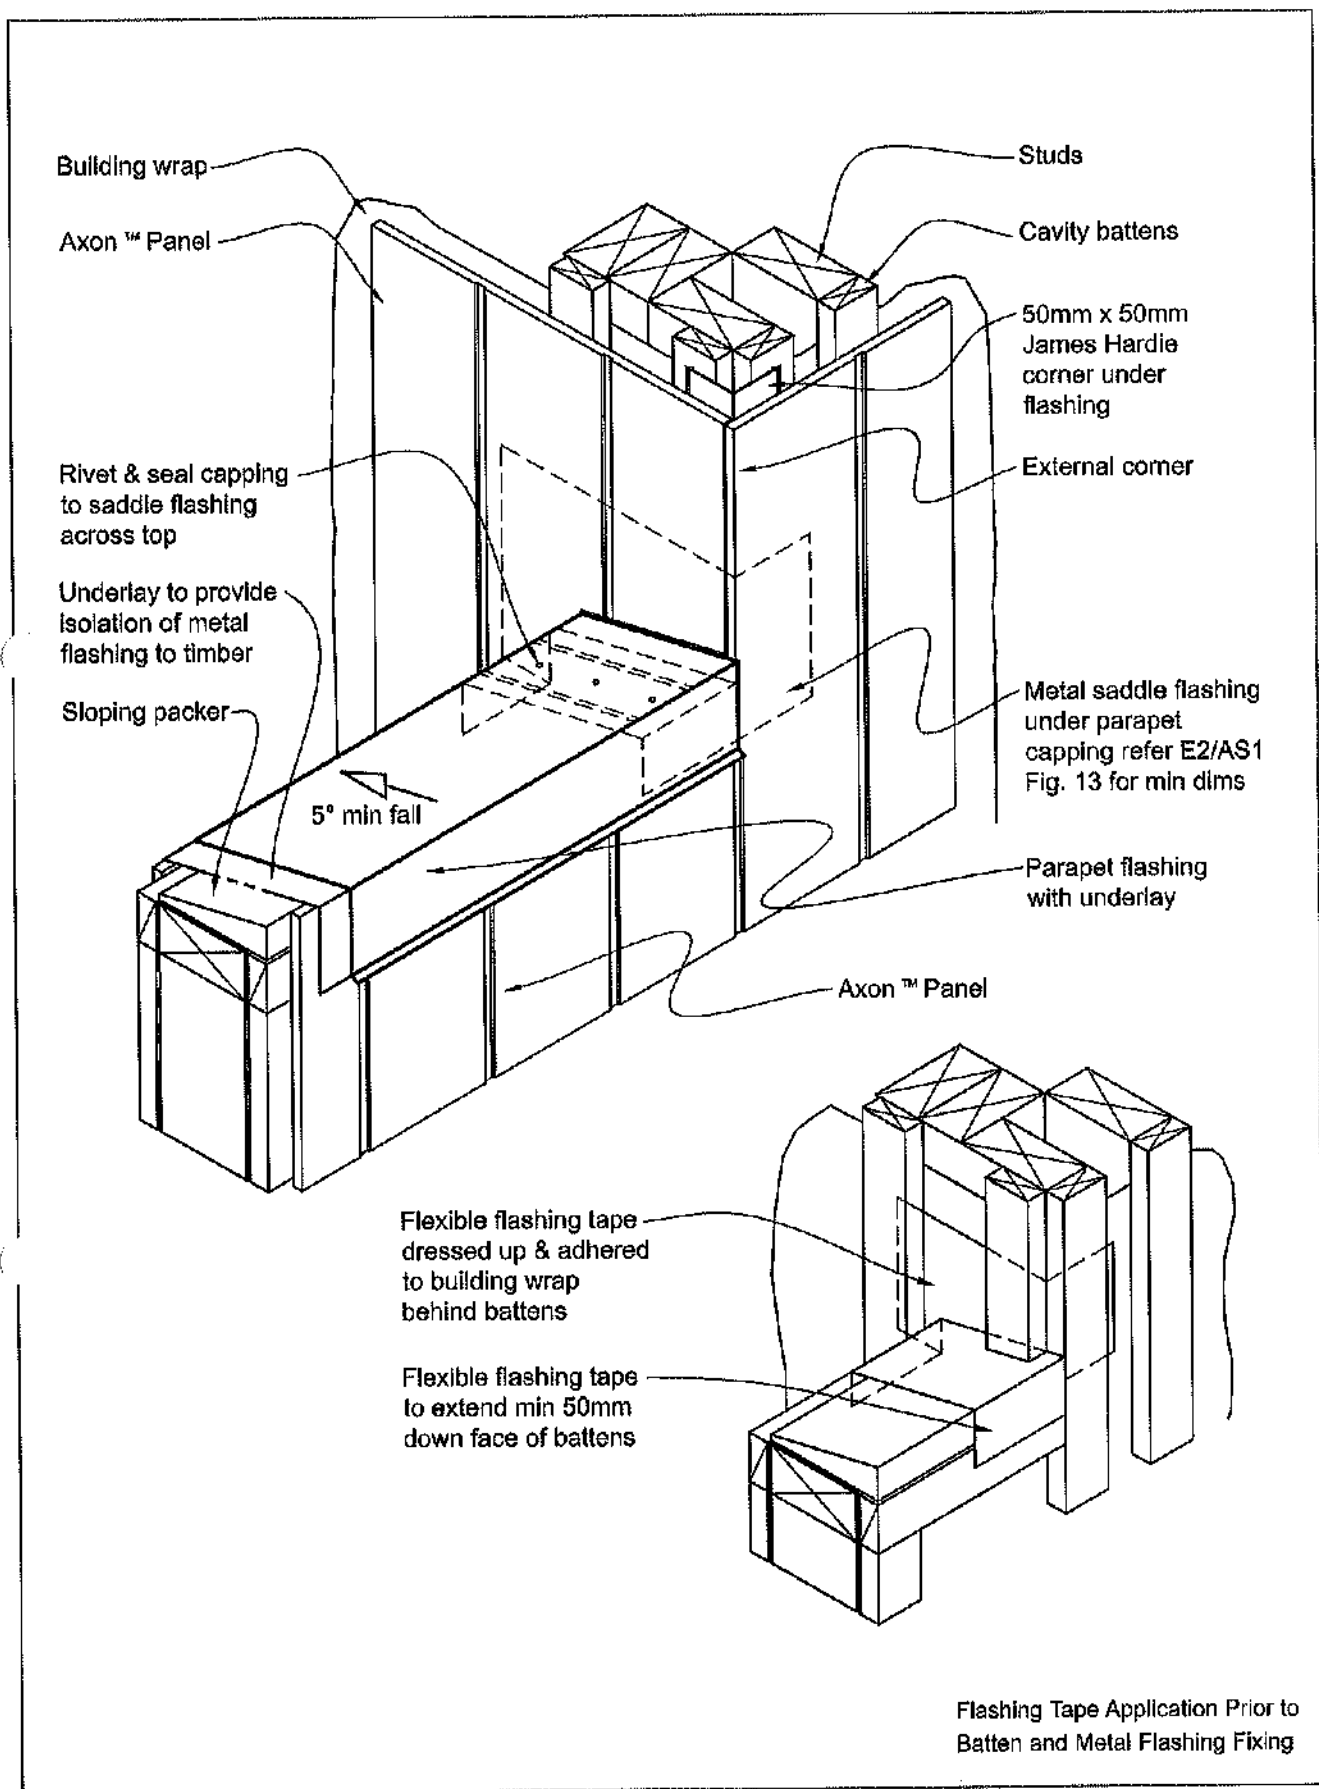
ENCLOSED BALUSTRADE TO WALL
